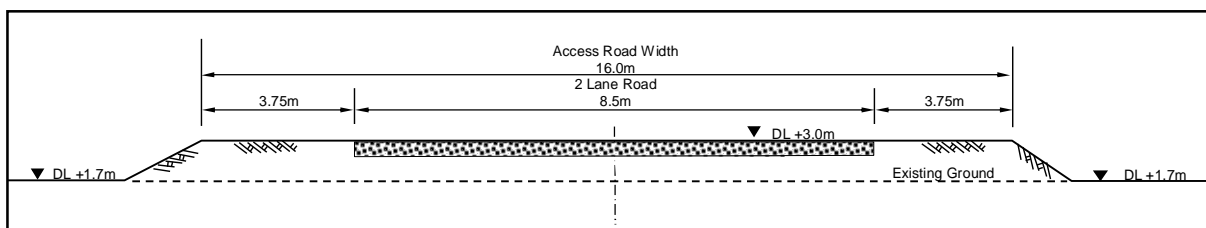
Cross Section of Bank Backside Portion of South Access Road
